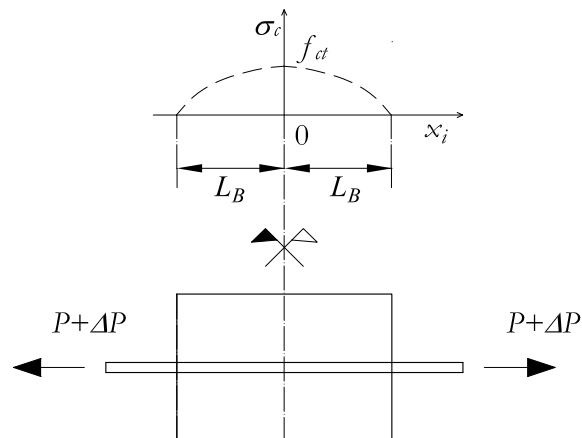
Representative concrete block at maximum crack spacing configuration.
